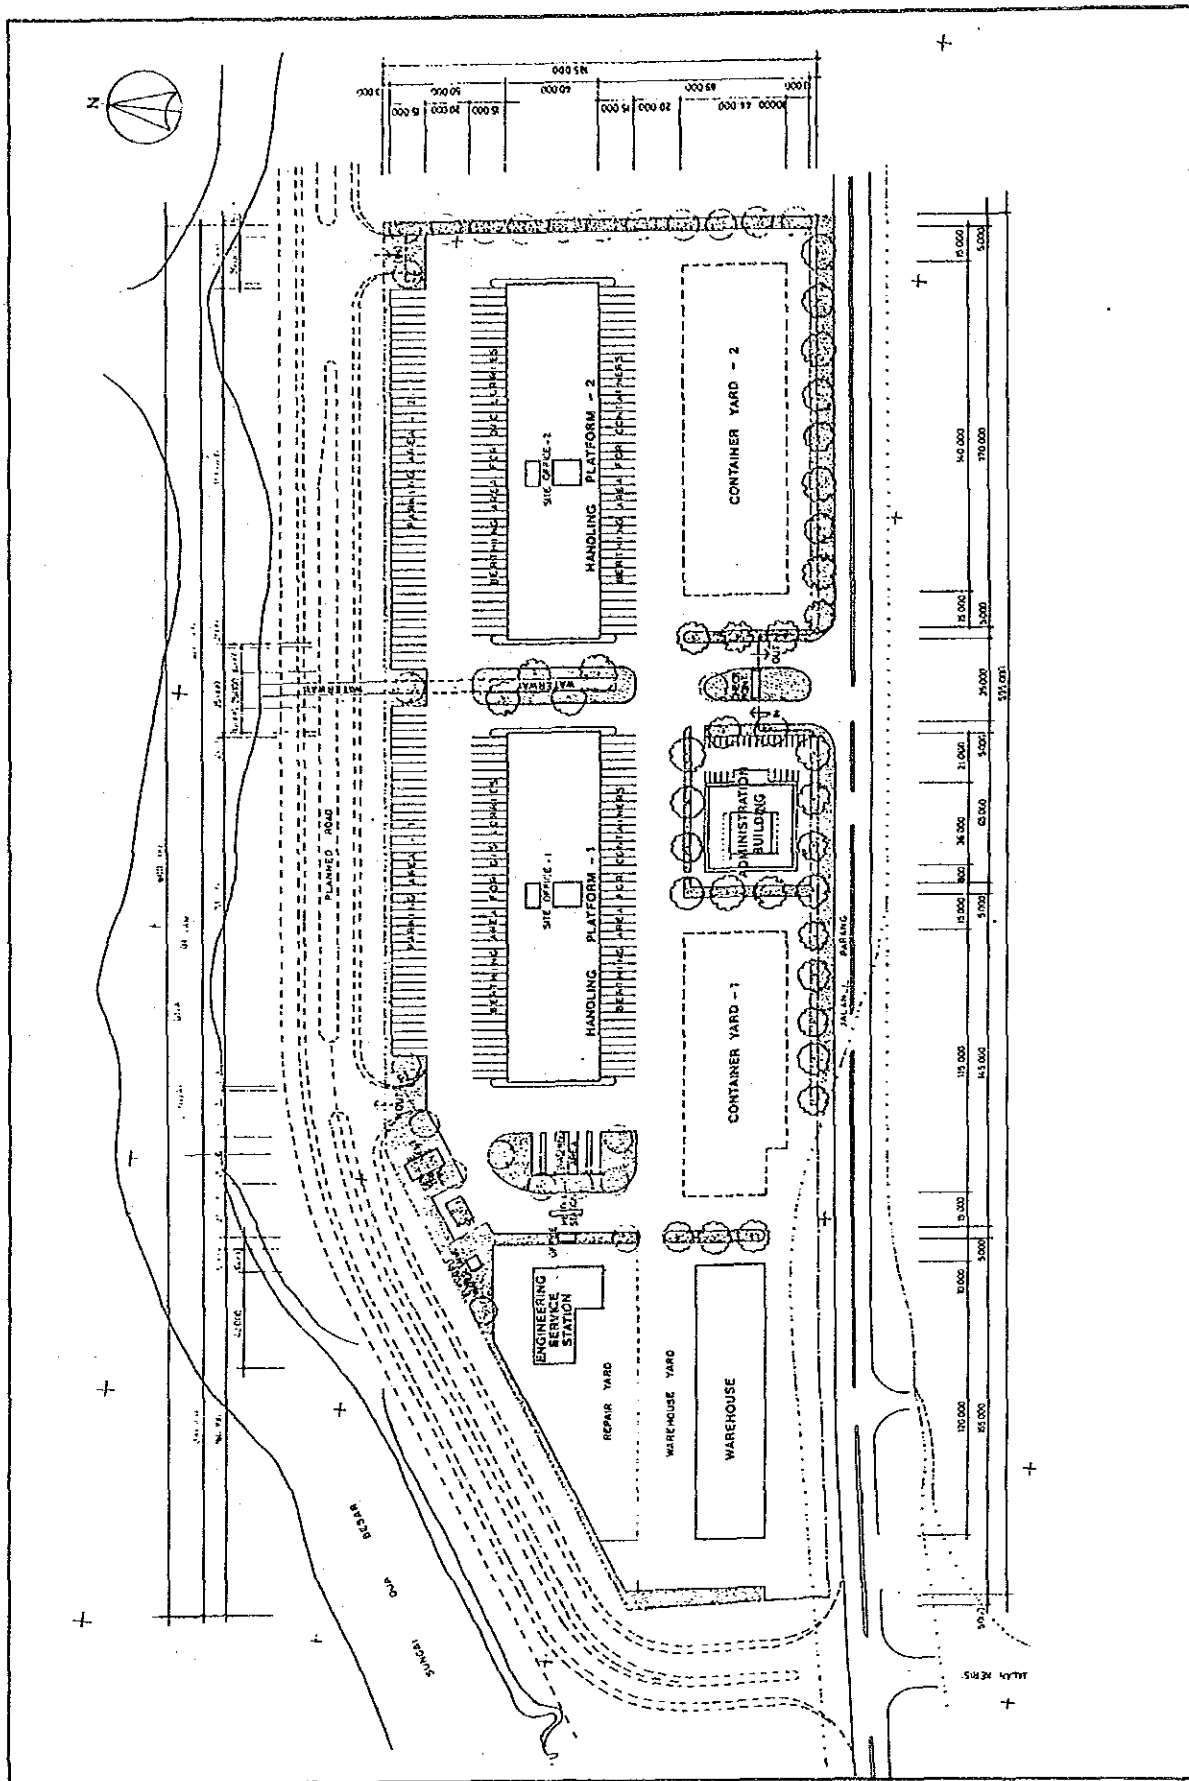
Layout Plan of Multi-modal (West) Terminal
